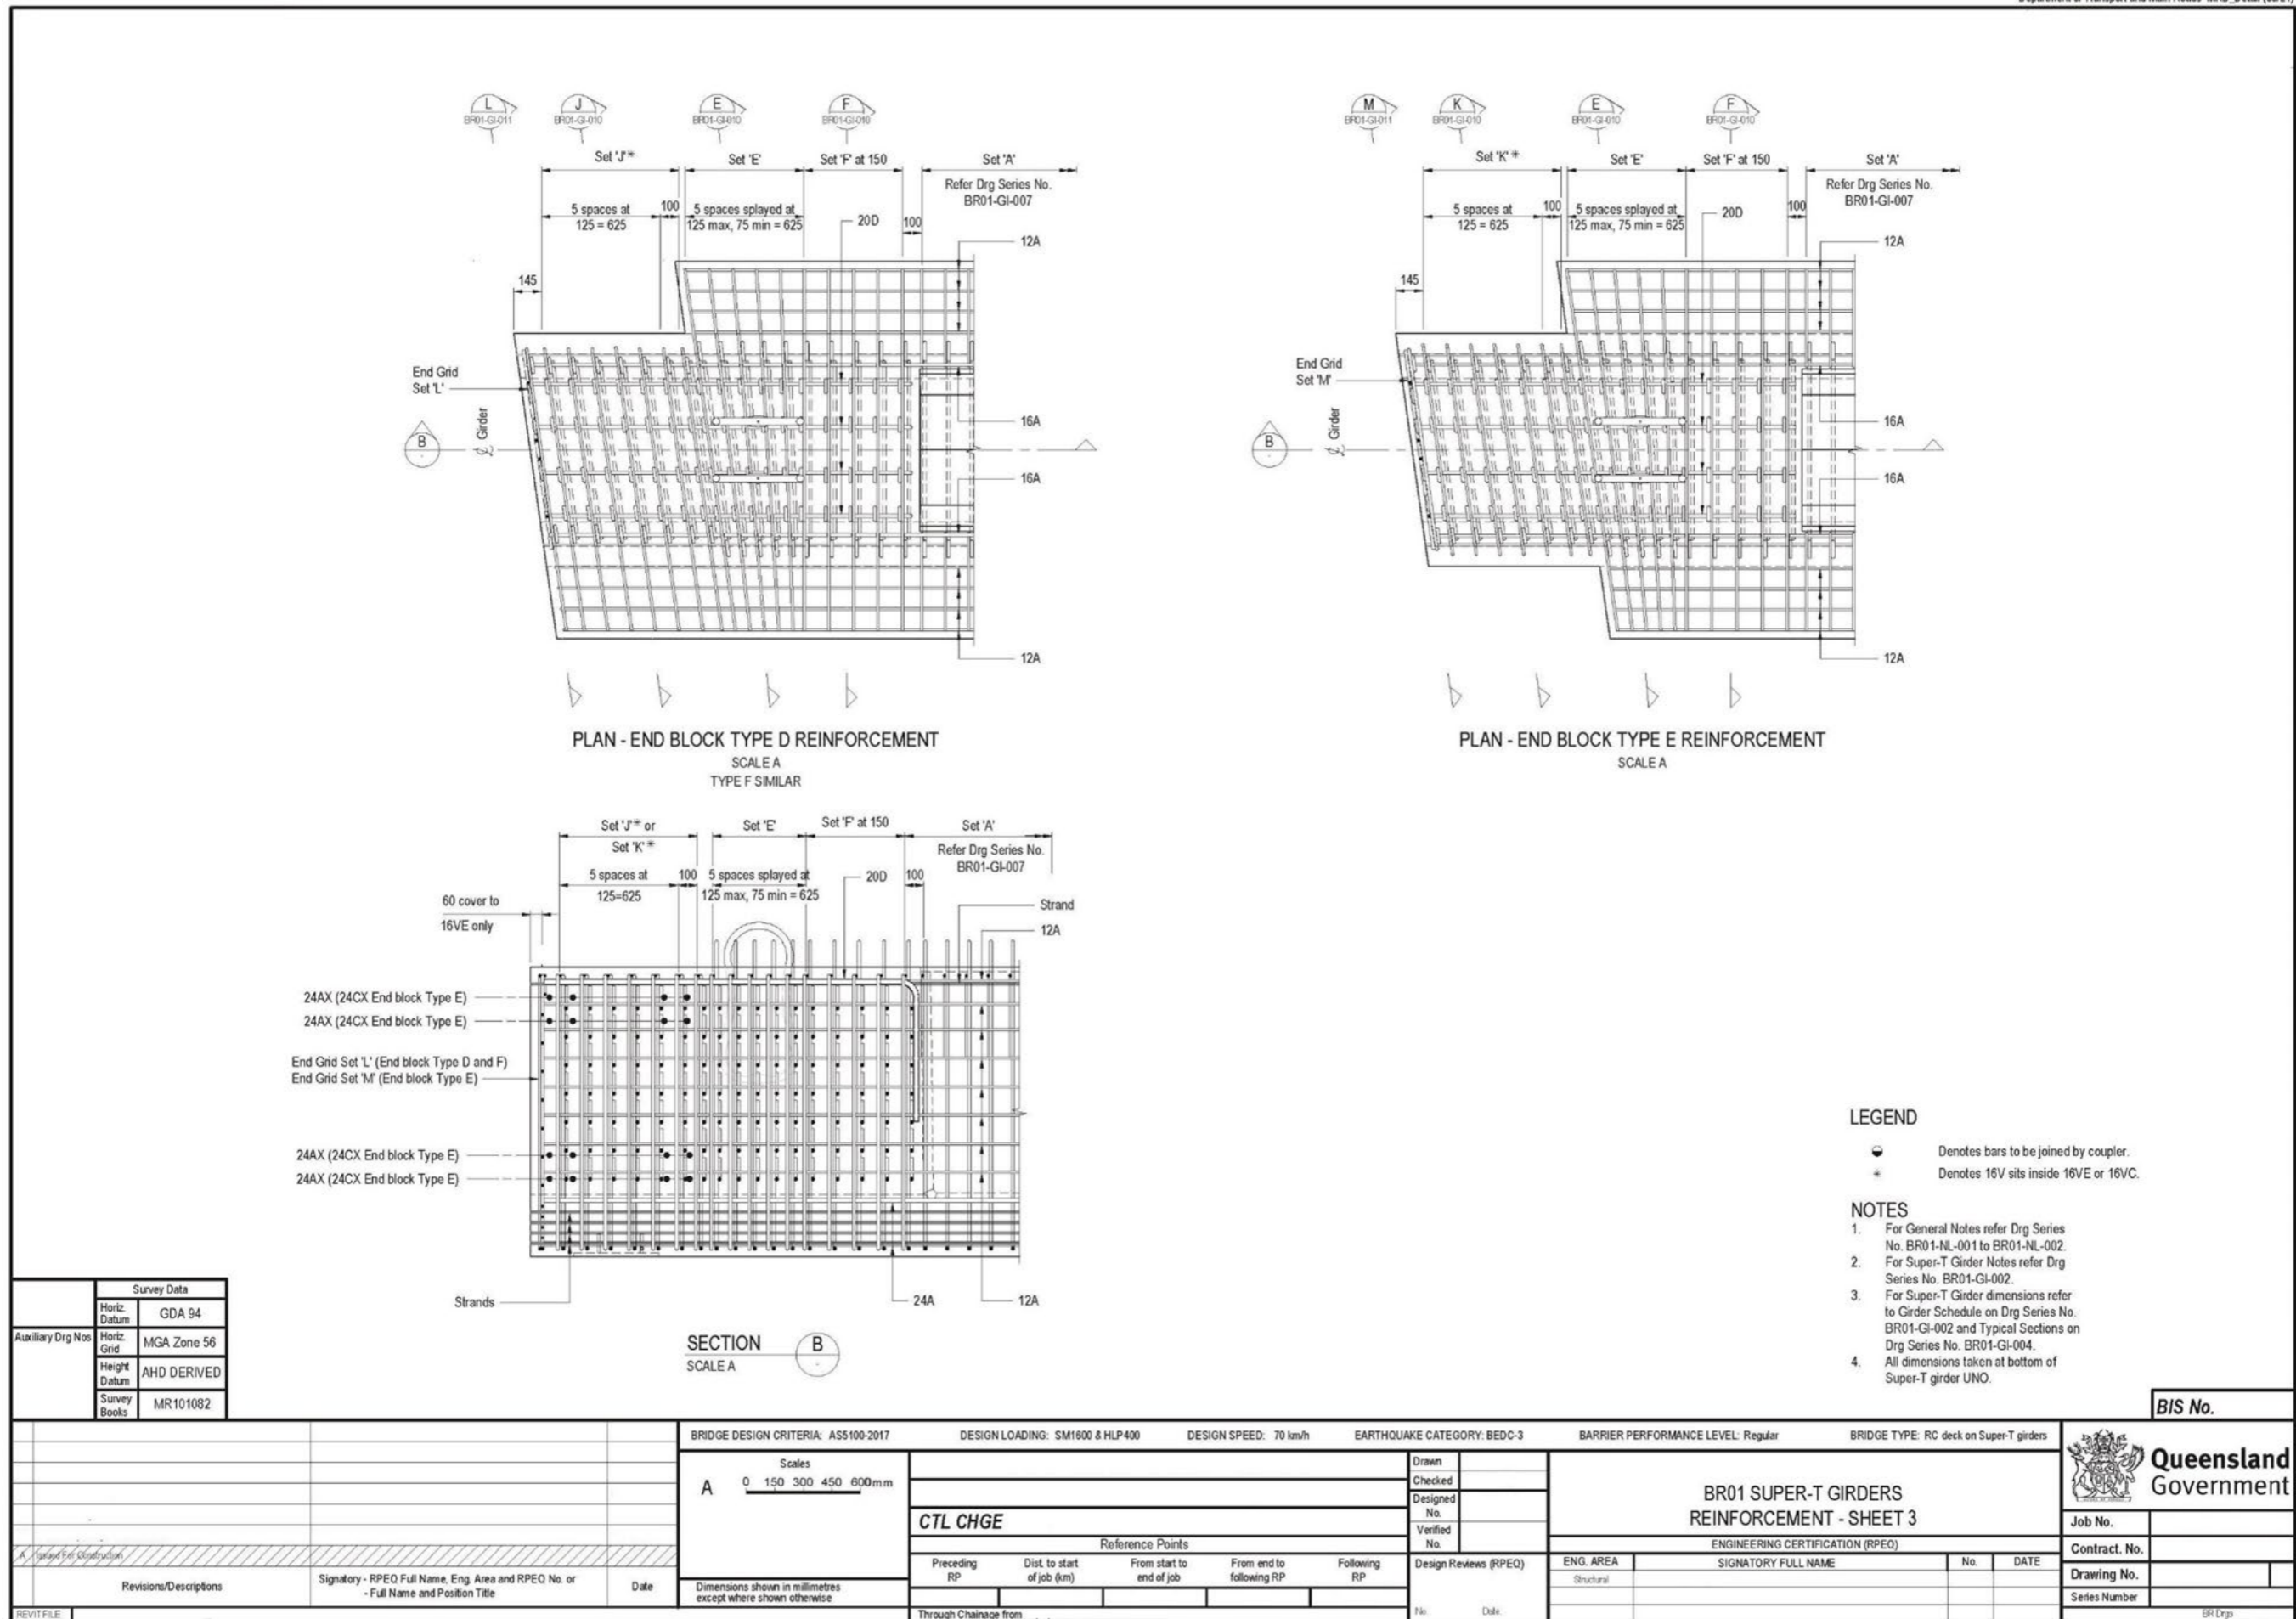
(k) - Example Super-T girder bridge drawings - Sheet 11
